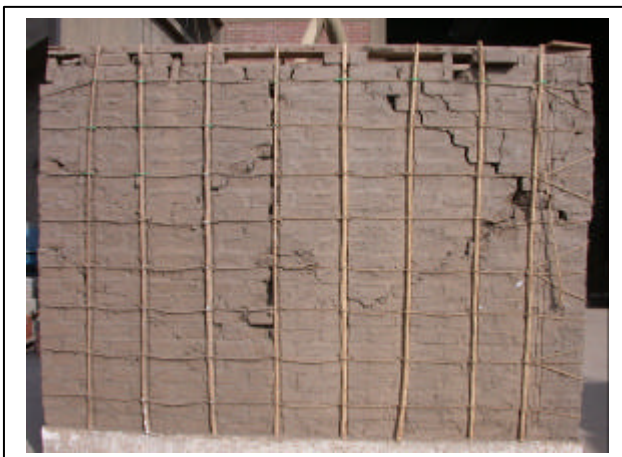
Model 1 West wall, The right half without plaster show greater damage than the left half.
